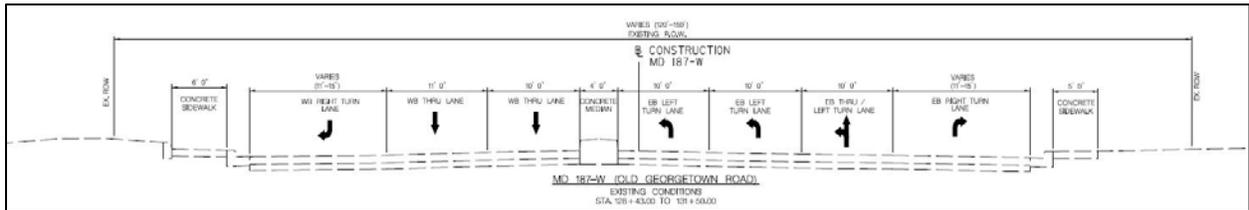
Existing Cross Section – Old Georgetown Road (MD 187) just west of Rockville Pike (Looking East)
